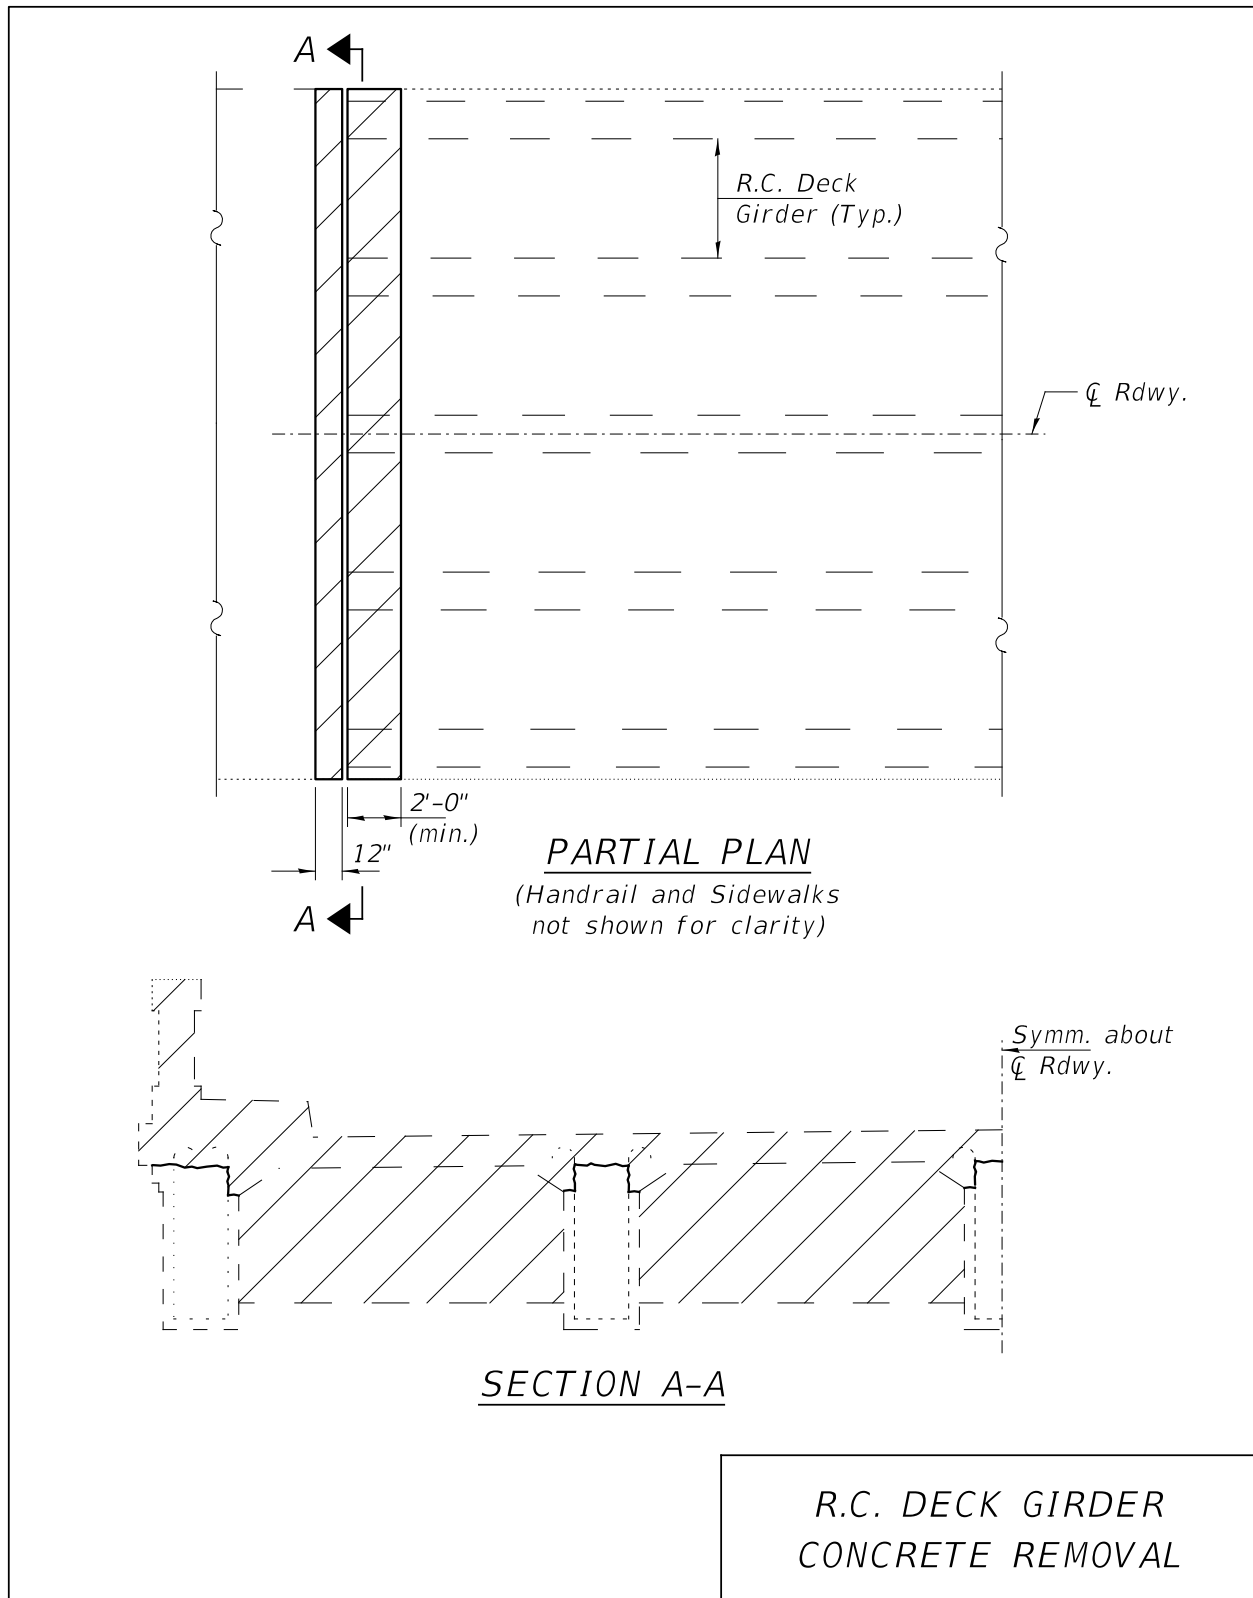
R.C. Deck Girder Concrete Removal
